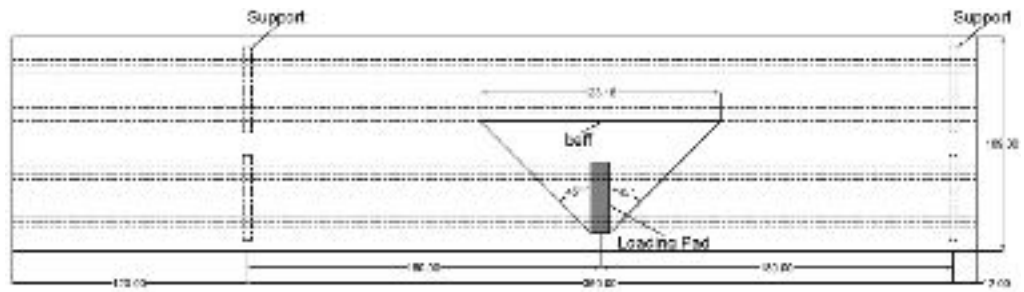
Punching shear failure in the Test E-2 of FIU bridge.
